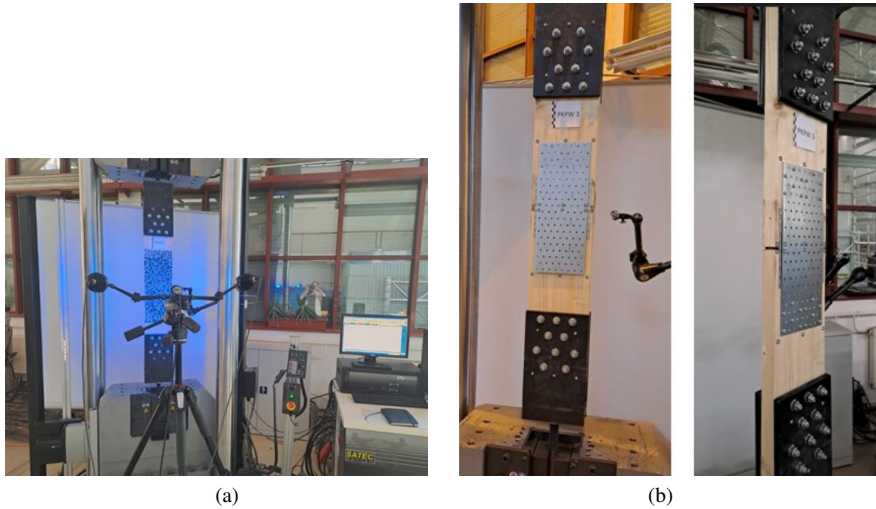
Research setup: (a) general view, (b) view of the connection from group GB3 prepared for testing before reinforcement and after reinforcement
